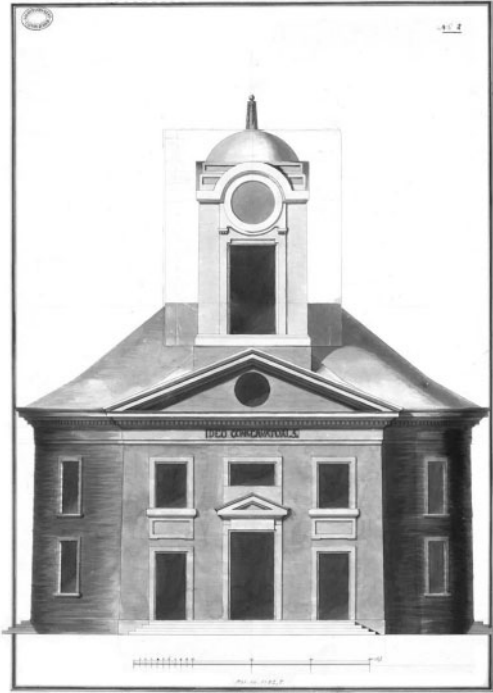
Main façade of an oval church building. Design plan by David Vogel around 1780 (StAZH, PLAN R 310).
